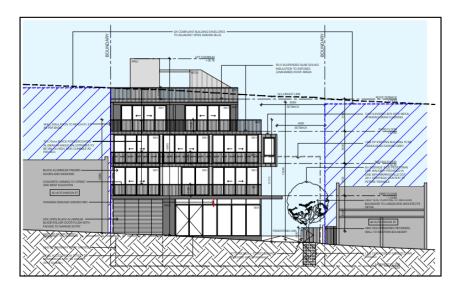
Proposed northern (front) elevation, showing setback from the western side boundary to ensure a transition in scale to the adjoining dwelling houses (source: Brenchley Architects)
